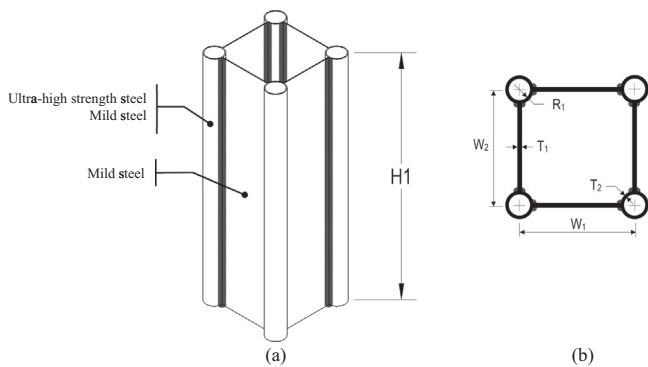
(a) Hybrid fabricated column and (b) Column cross-section.
